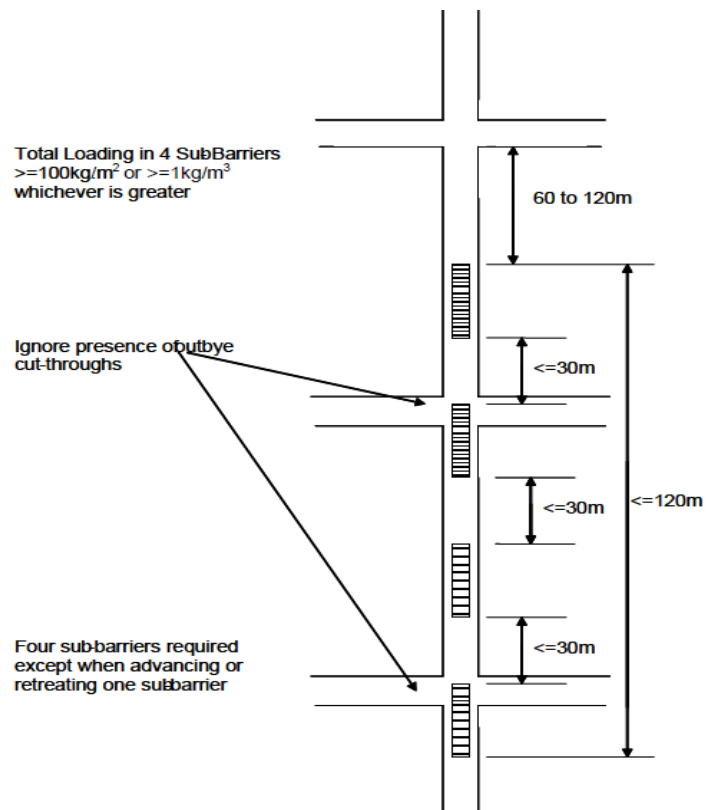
Example of Typical Discontinuous Distributed Barrier Arrangement [3]
